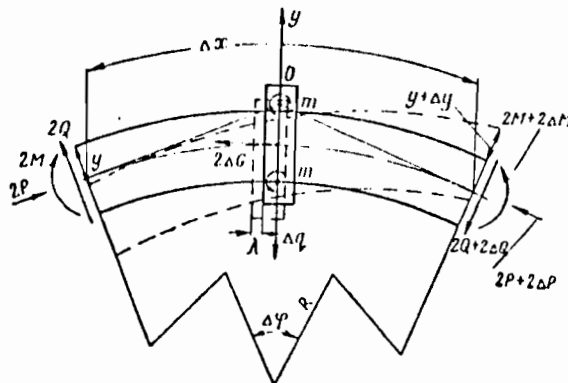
Equilibrium conditions for a deformed track elements under the action of longitudinal and transverse forces
